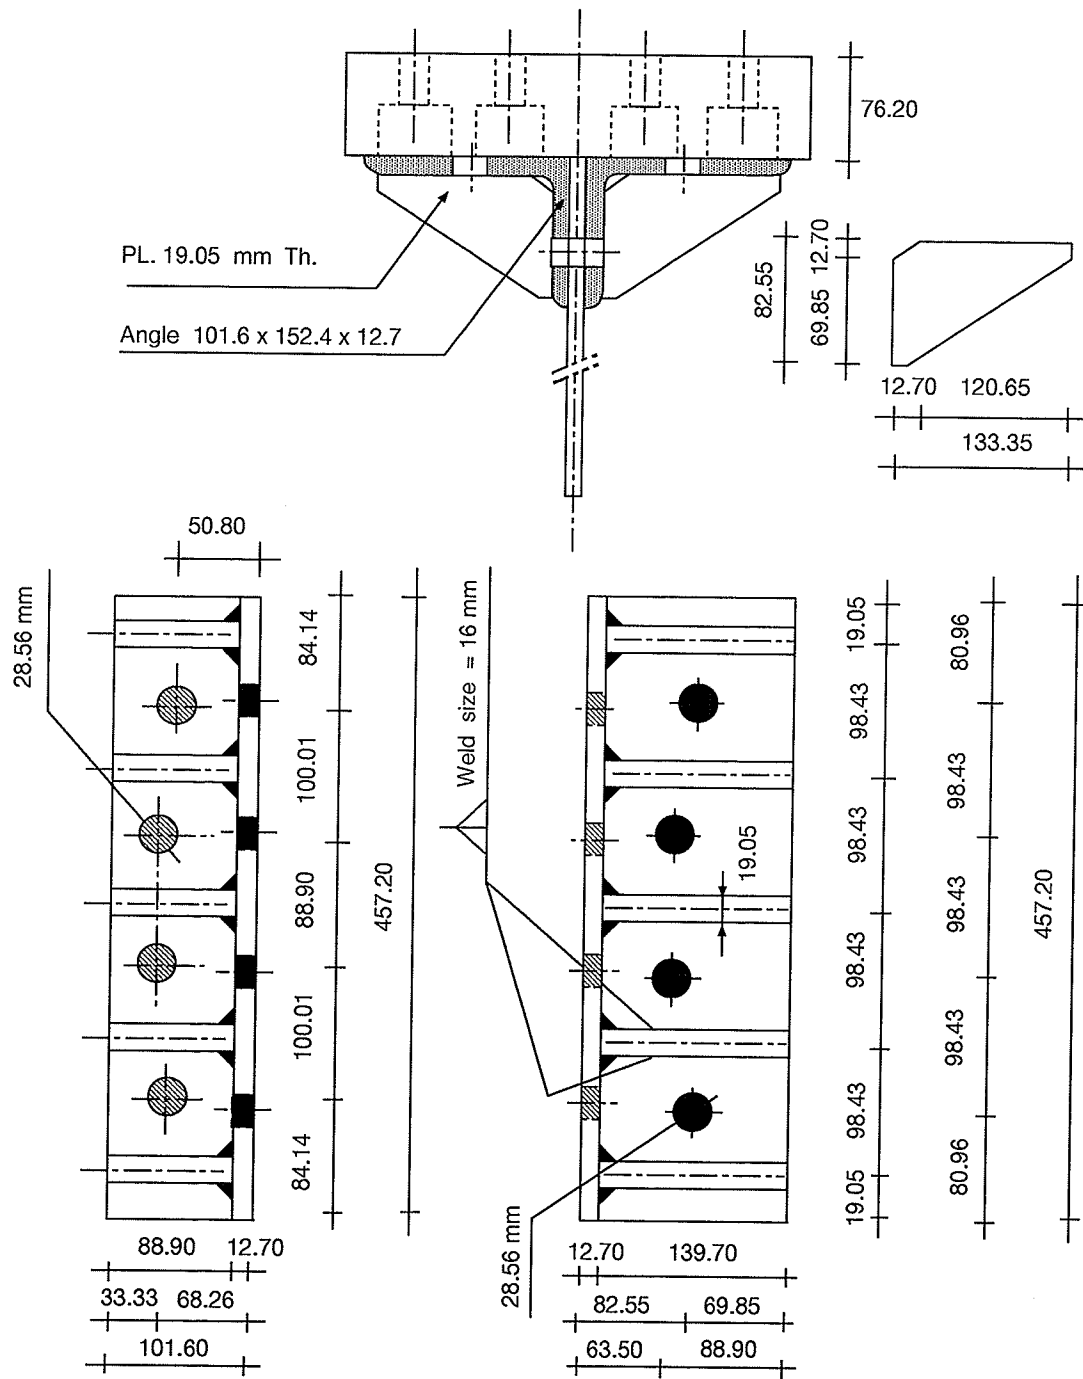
Details of Top Angles Used with Test Setup # 2.
